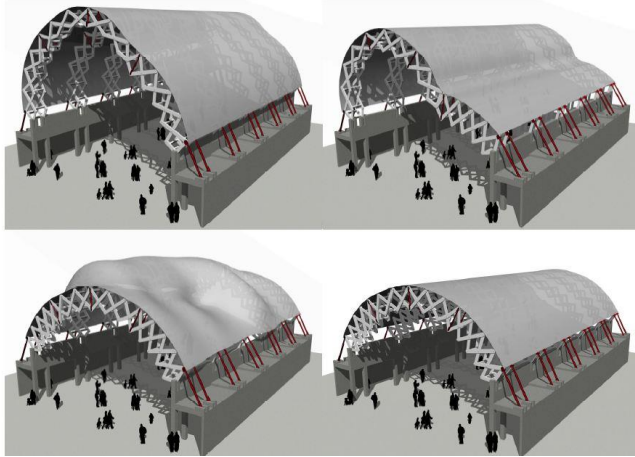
Proposed planar scissor-hinge structure as an adaptive roof (Source: Akgün, 2010)
